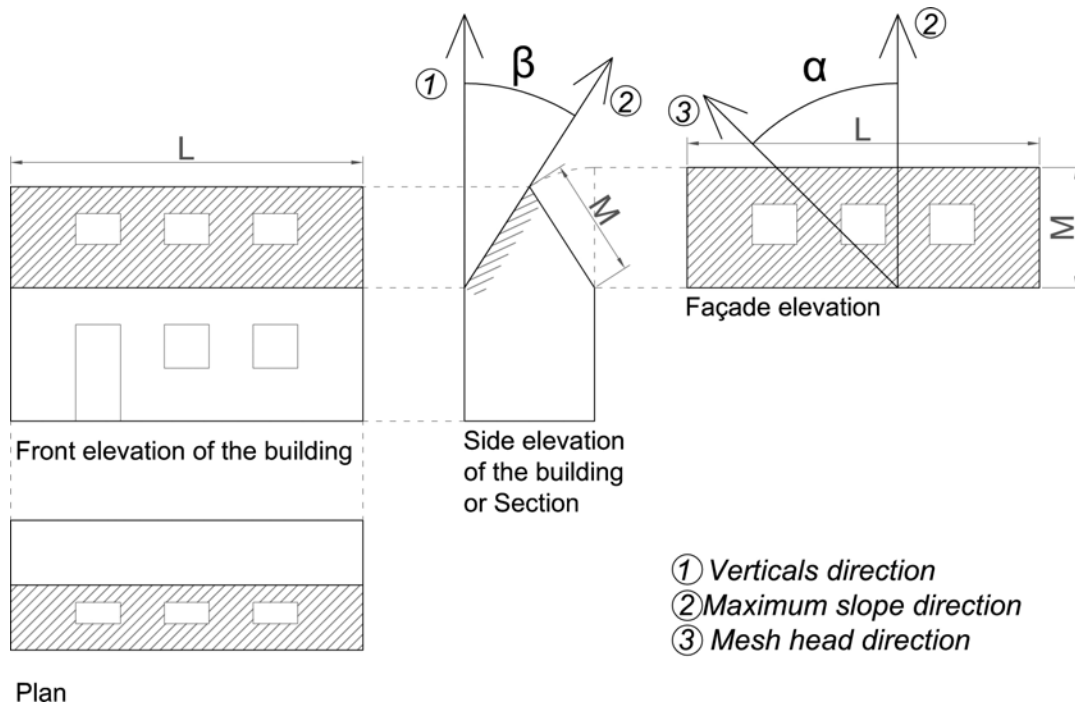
Architectural plans of the case study. Measuring α angle in the elevation of the envelope and β angle in the side elevation of the building (or section)
